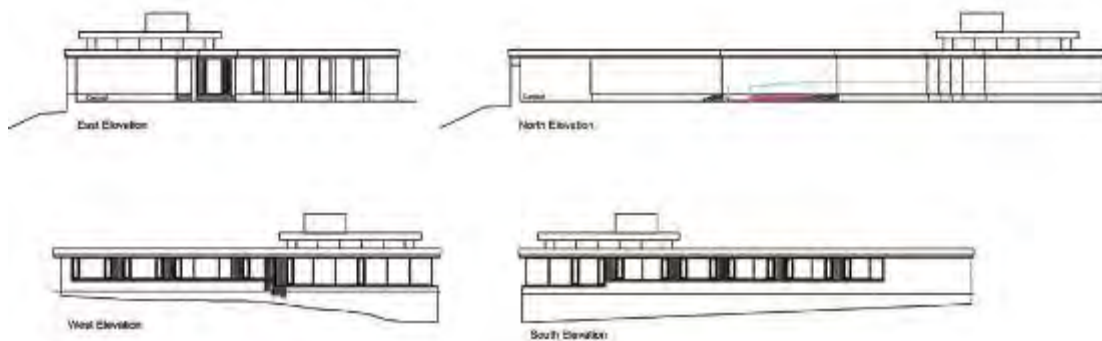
Elevations of the Principal’s House 2009. Note how all the windows face south or west, and the highlighting of the reception area with the clerestory windows breaking above the roofline. *UoSA
